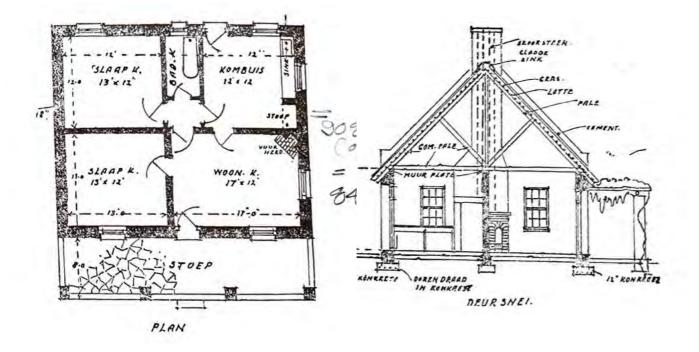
Typical simple farm house plan and section (Fisher & Le Roux 1986: 28)
